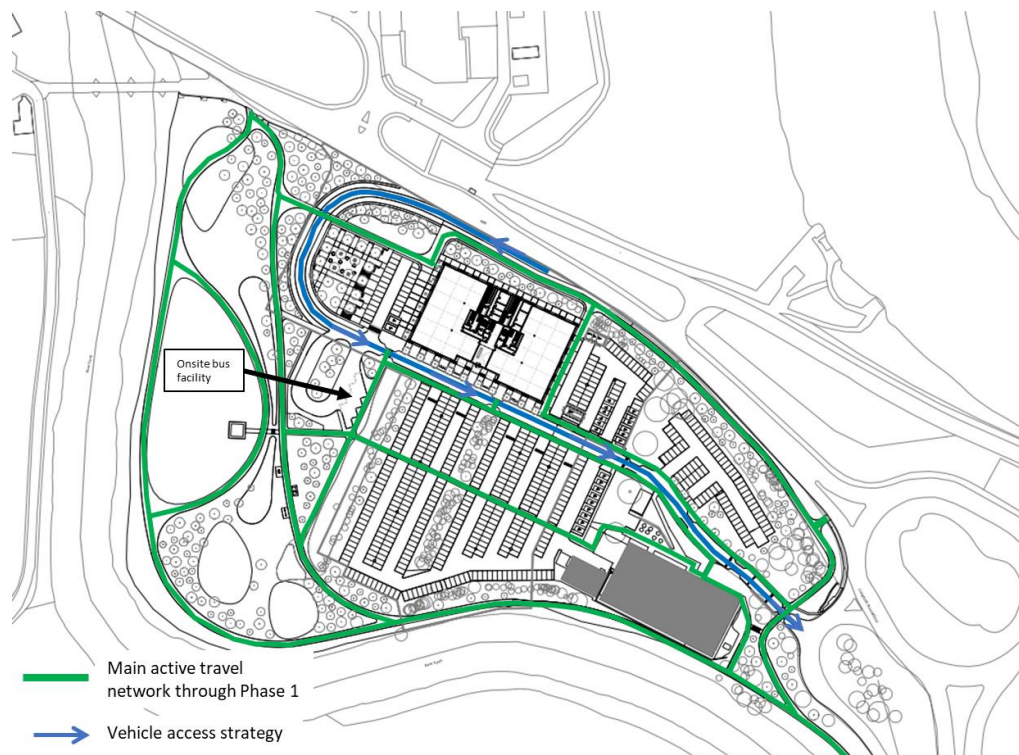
Phase 1 site layout (plan provided by Stellan-Brand)
